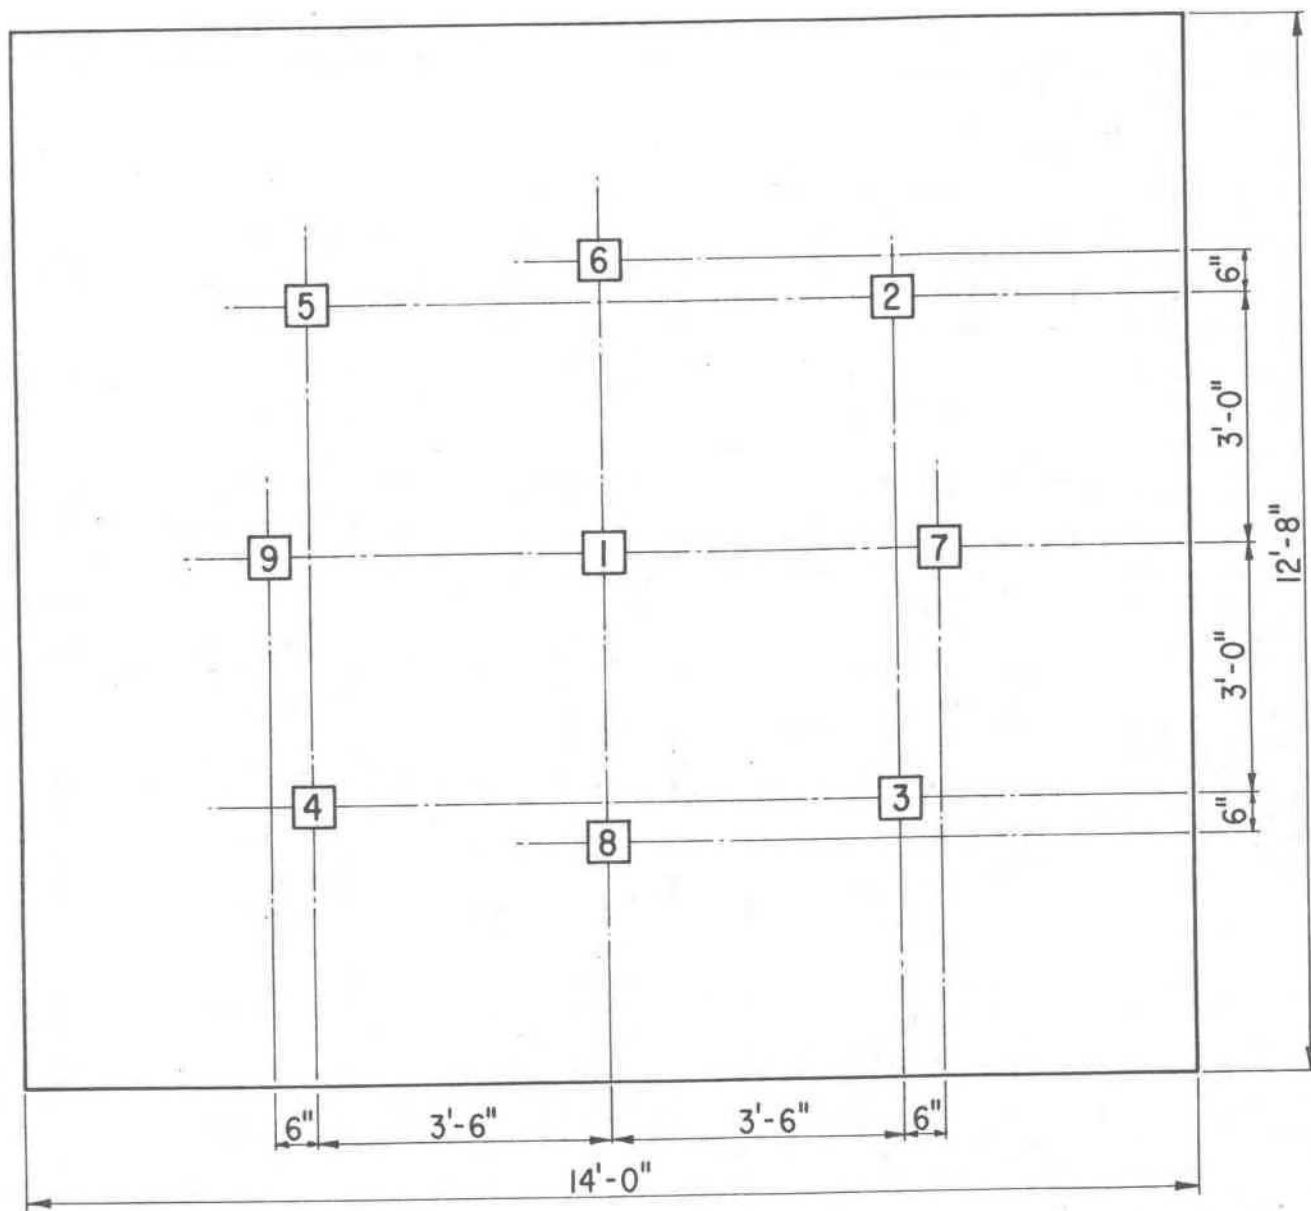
LOCATION OF THERMOCOUPLES ON THE UNEXPOSED SURFACE
